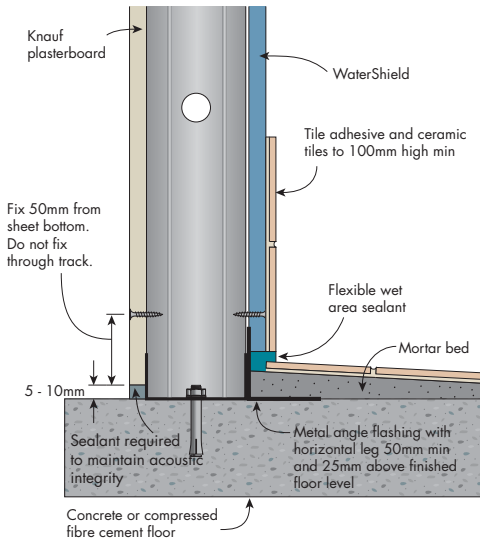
Wall Base in Wet Areas (Outside Shower)
